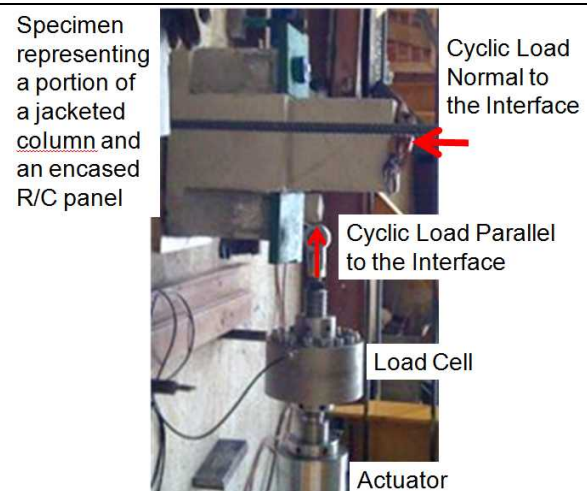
Loading arrangement of a portion of encased R/C panel and the jacketed column
